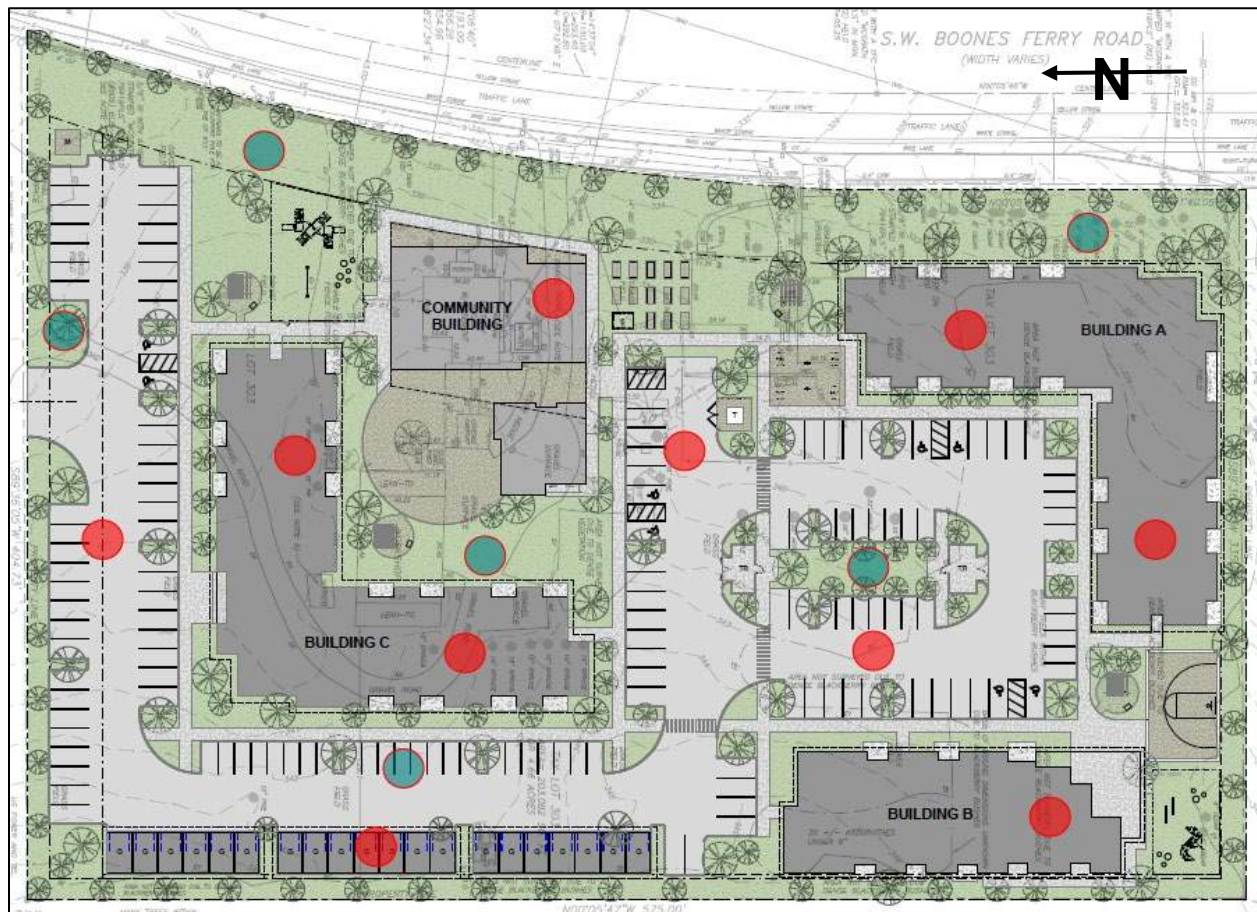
Proposed site plan (source: undated Sheet A0.00 by Carleton Hart Architecture).
